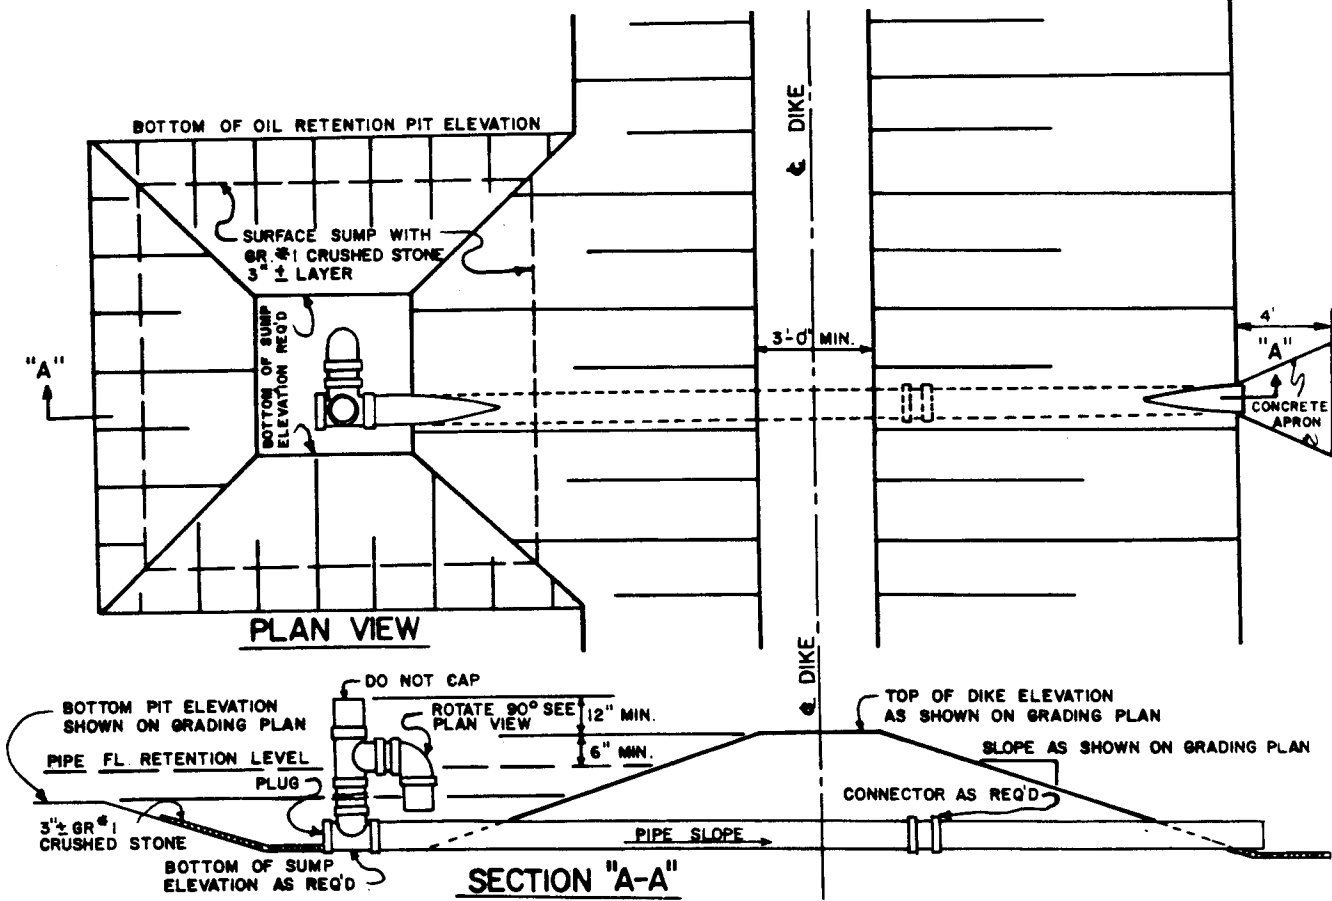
Oil Trap Construction Using Galvanized or PVC Pipe
